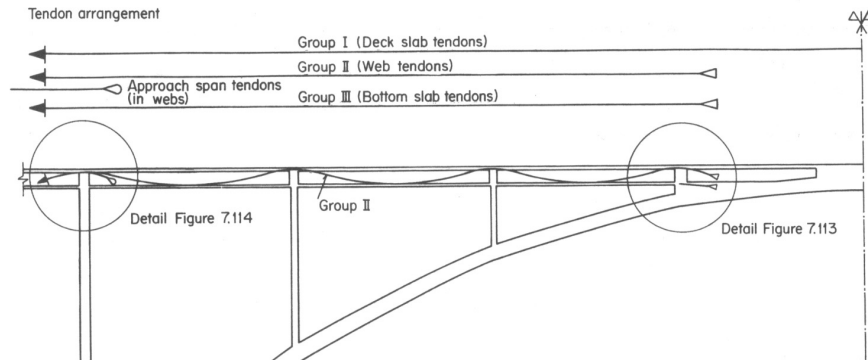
Prestressing Tendon Arrangement in the Deck Girder<sup>23</sup>
